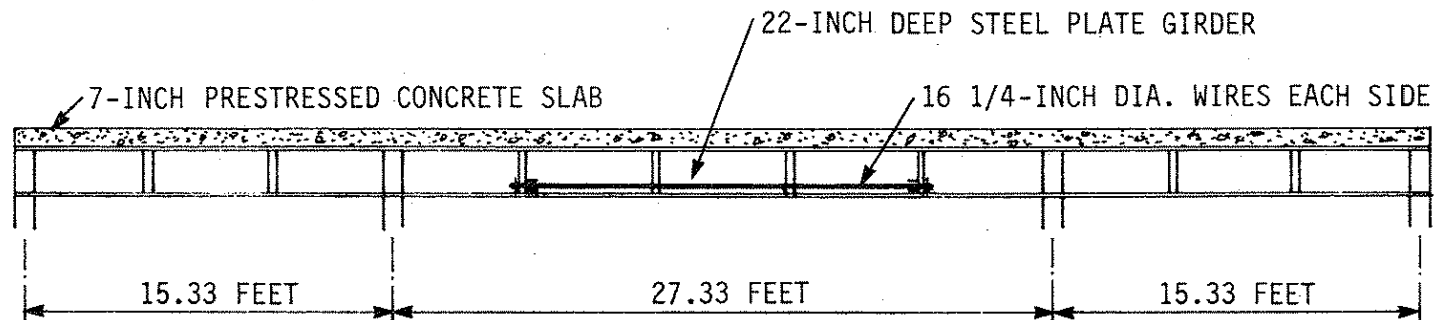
Three-span, prestressed composite girder for an Oakland, California apartment building, circa 1967.
